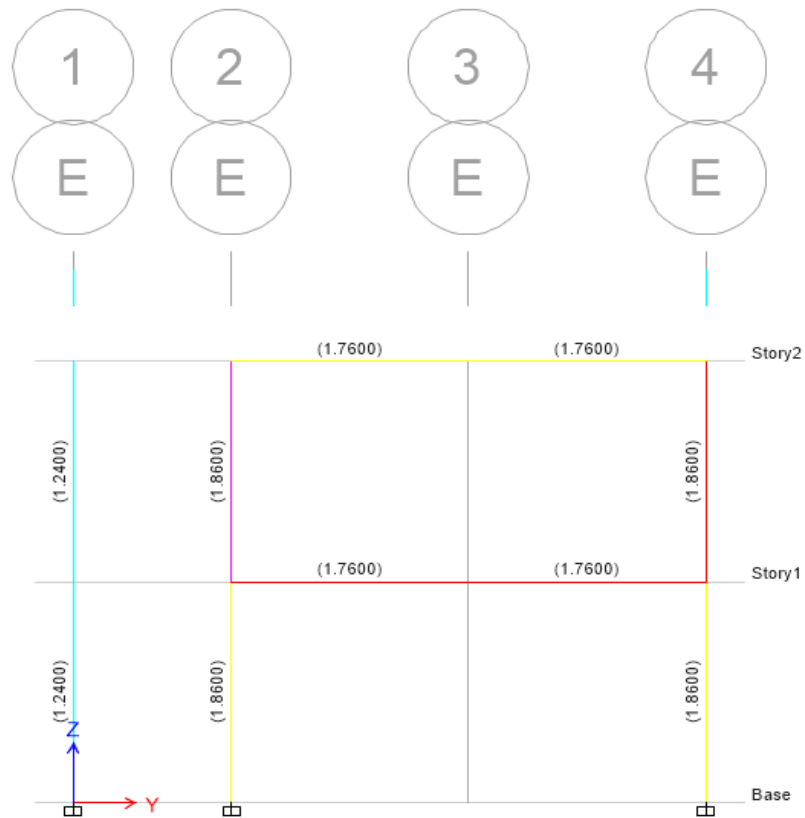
Elevation view to identify failed beams along the frame E-1234
